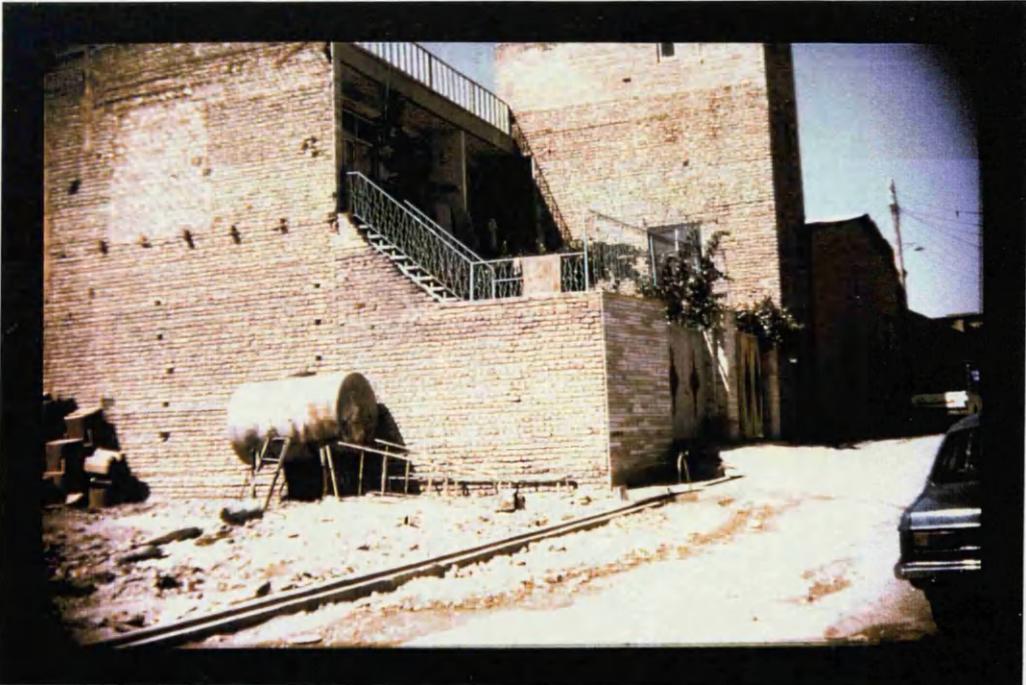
Two-storey building in Karevan which has been legally built with an iron beam skeleton and kiln dried bricks.
